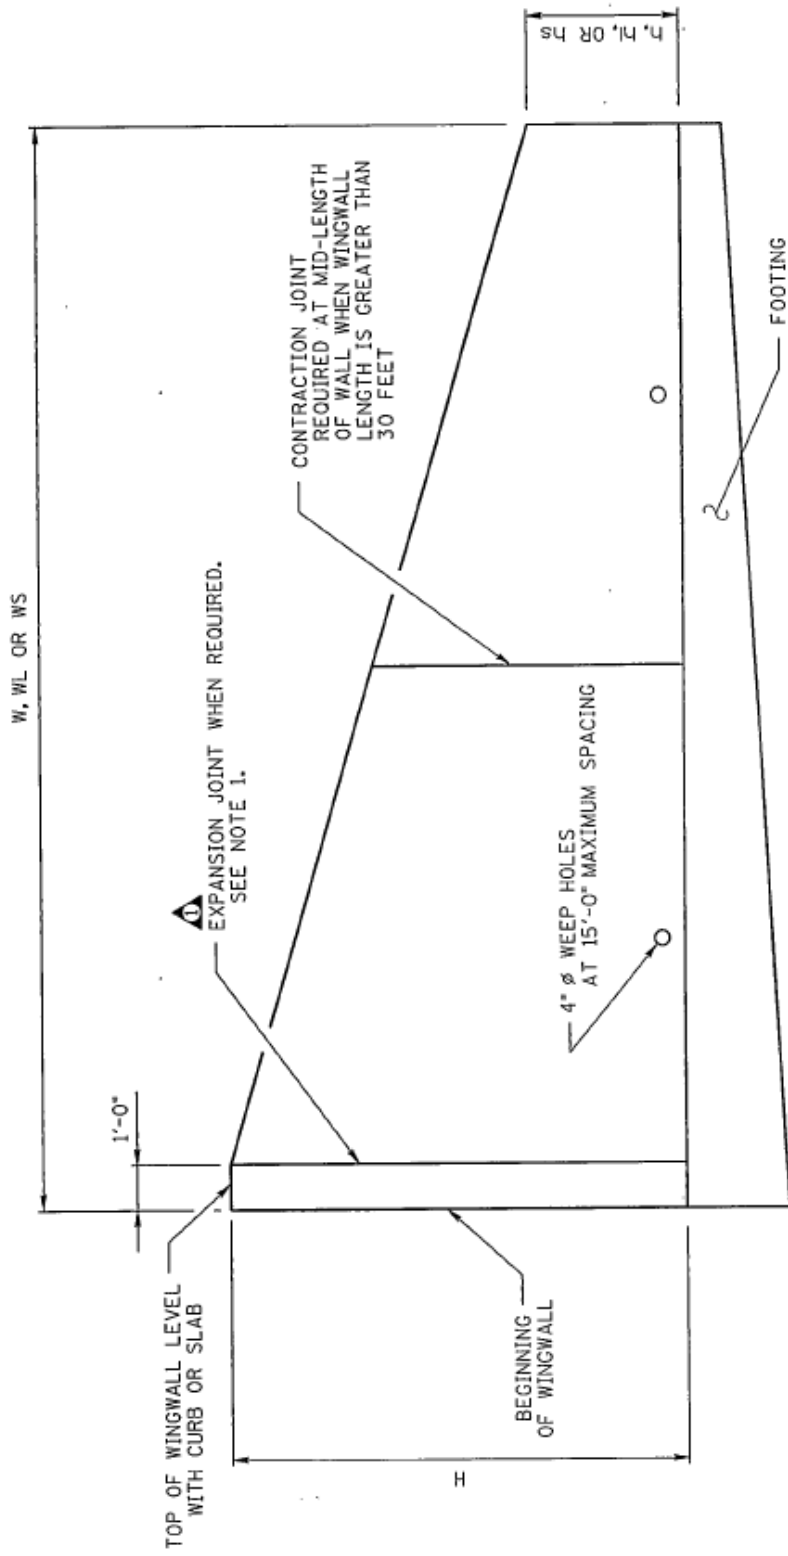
TDOT Wingwall Elevation View (TDOT 2000d)
